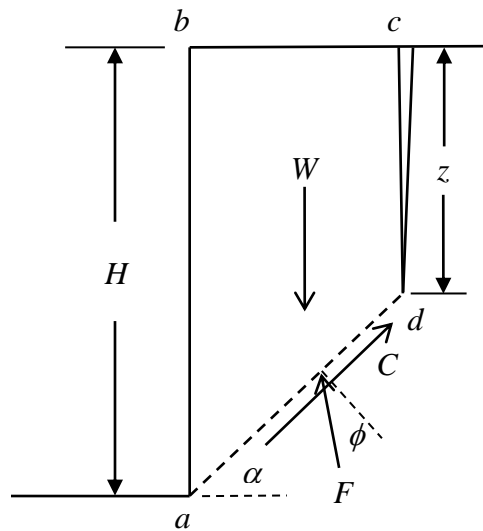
Vertical Slope with Plane Failure Surface and Tension Crack.
